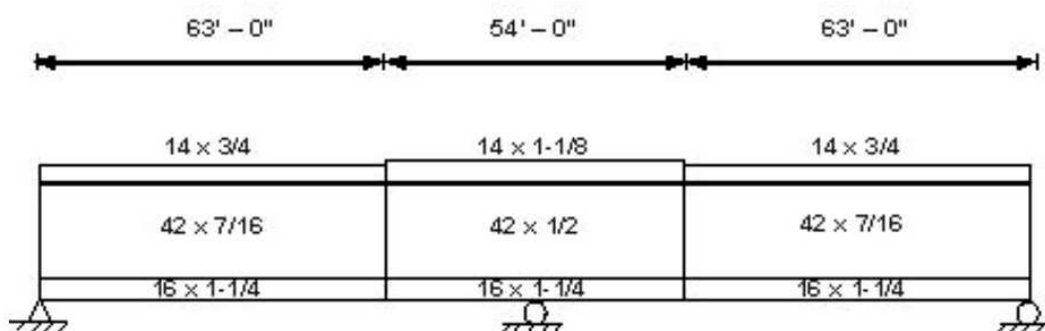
Sketch of typical steel girder elevation (Barth, 2012)
